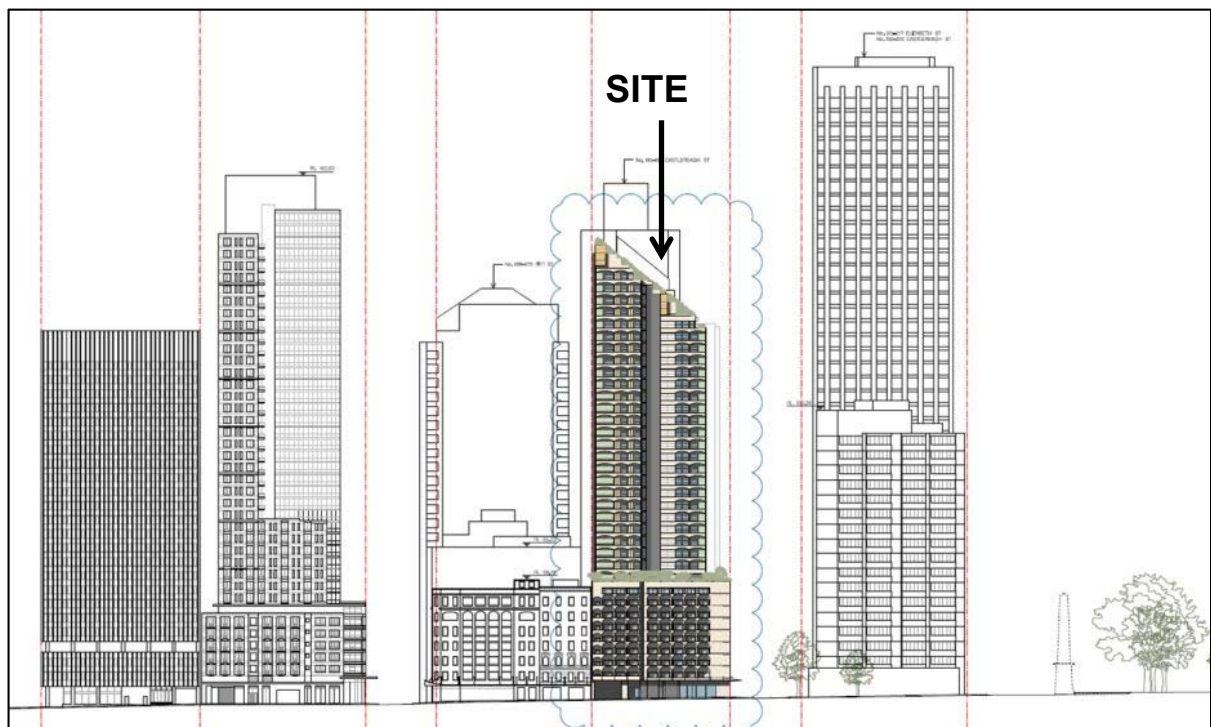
The proposed development as viewed in its Bathurst Street context (southern elevation)
